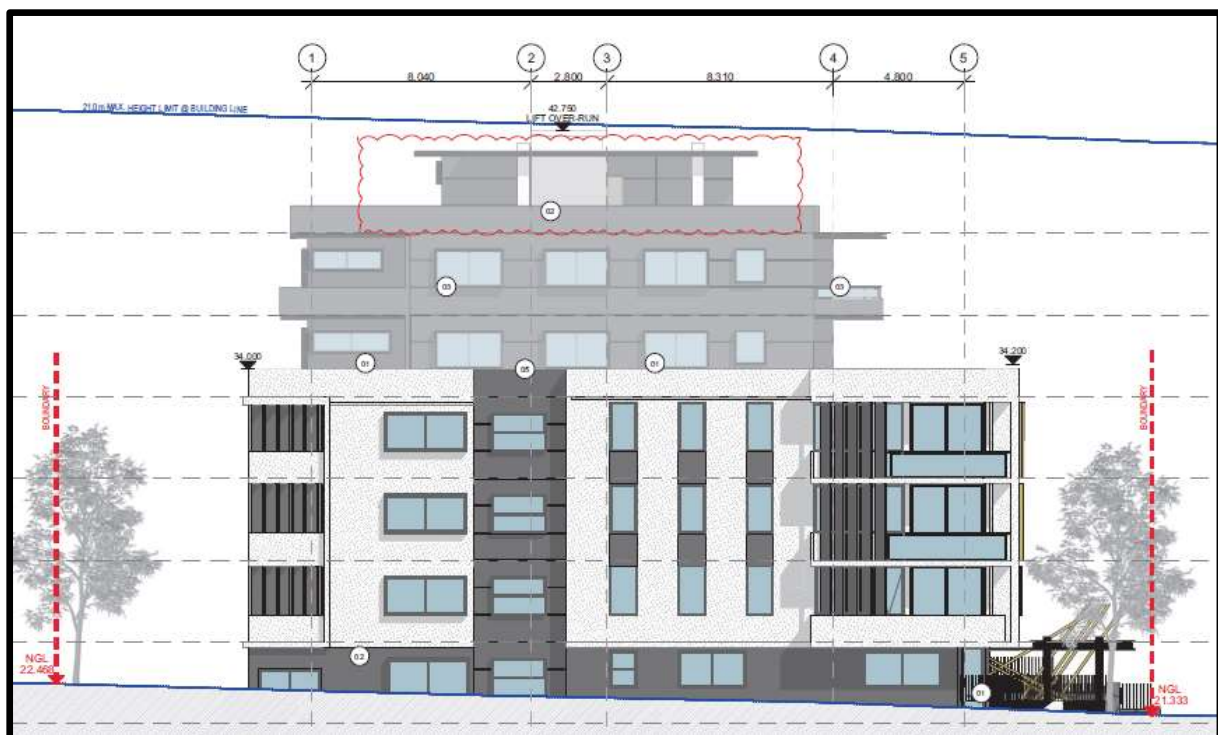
Front elevation of the approved RFB at No.5-9 John Street, Beverley Park (DA2017/0663) (courtesy Council records)
